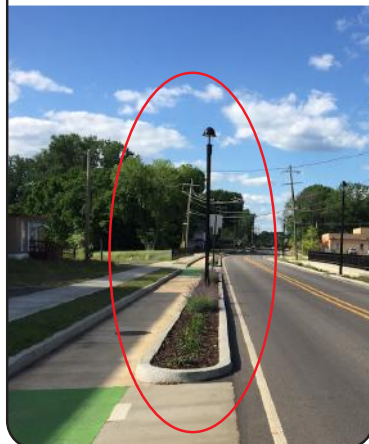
Cleveland-Massillion Road Typical Section (South of Ira)
